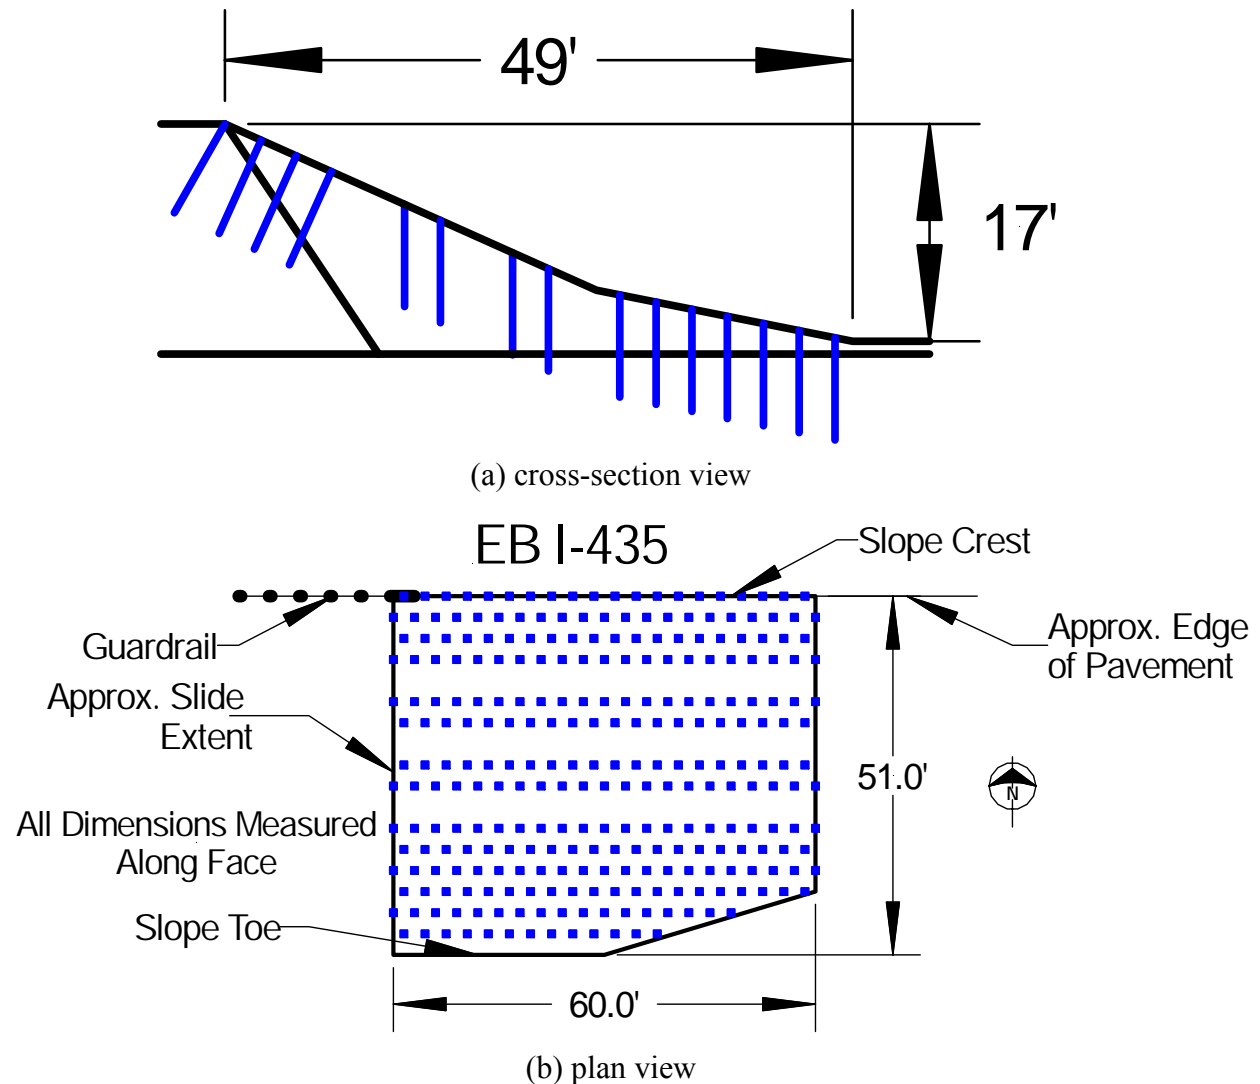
Selected stabilization scheme for the I435-Holmes Road site: (a) cross-section and (b) plan view.
